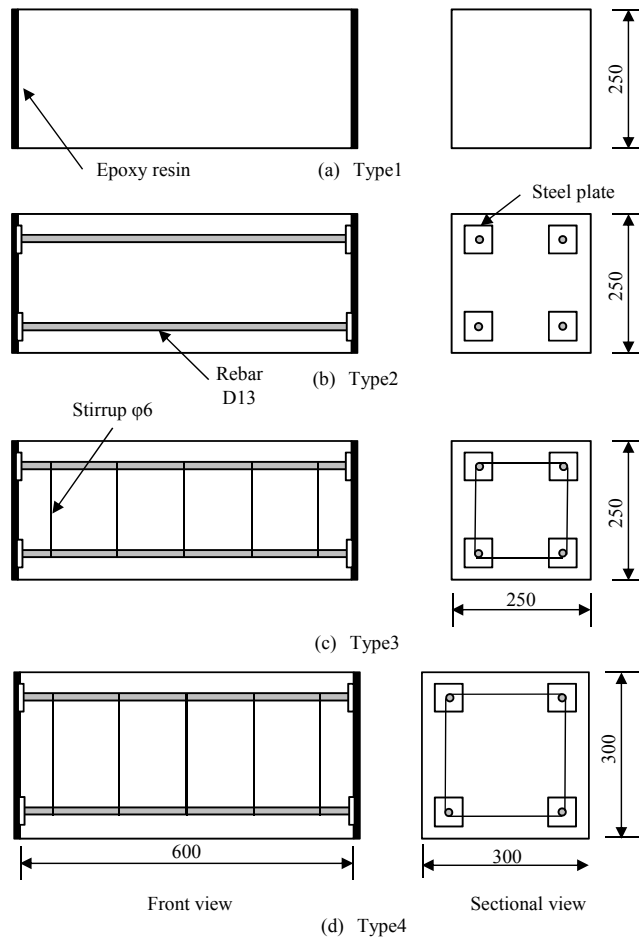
Shape of the test specimens in Test2. Type1 has no steel bars. Type2 has 4 rebars along the longitudinal direction. Type3 and Type4 have 4 rebars and 5 stirrups inserted across the longitudinal direction.
